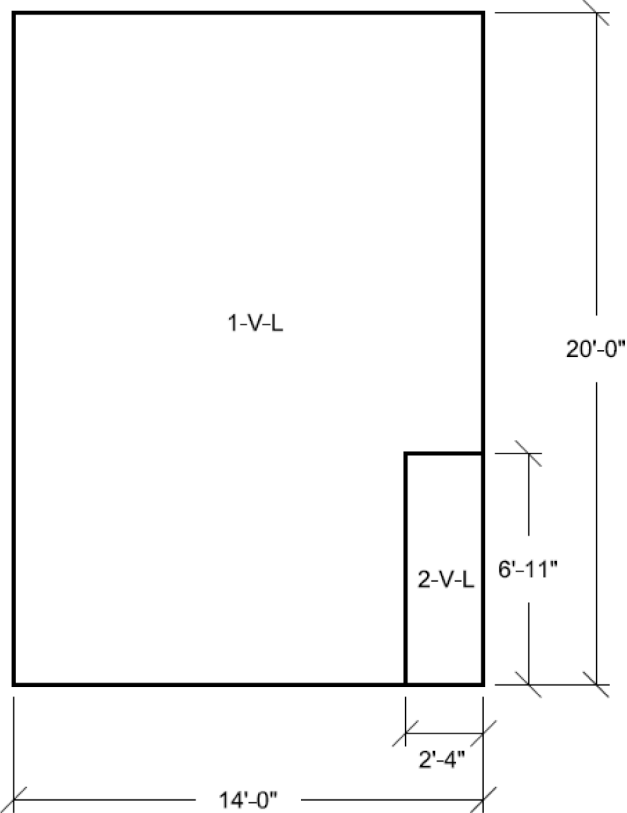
H.6-180A DGFOV Wall 10 Looking From Outside Vertical Reinforcement Zones Far Side Face
